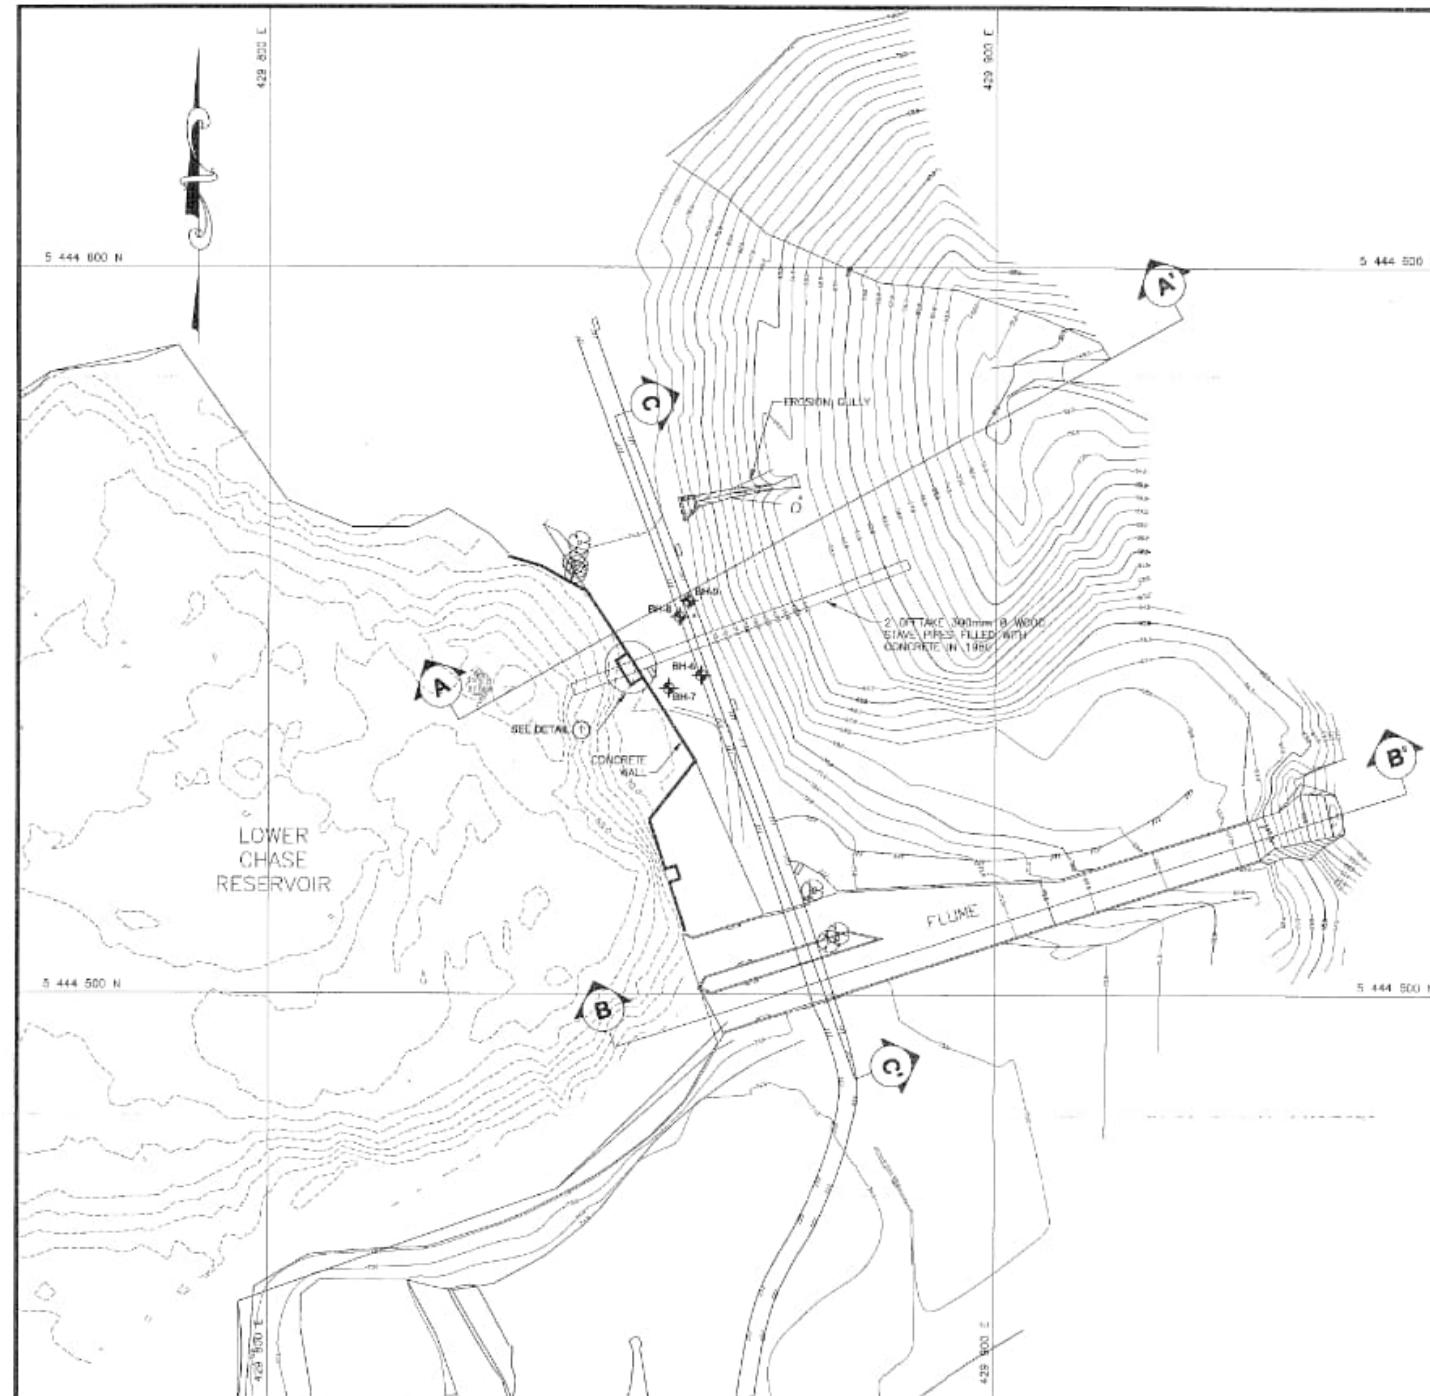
Plan and Cross Sections of Lower Chase River Dam
